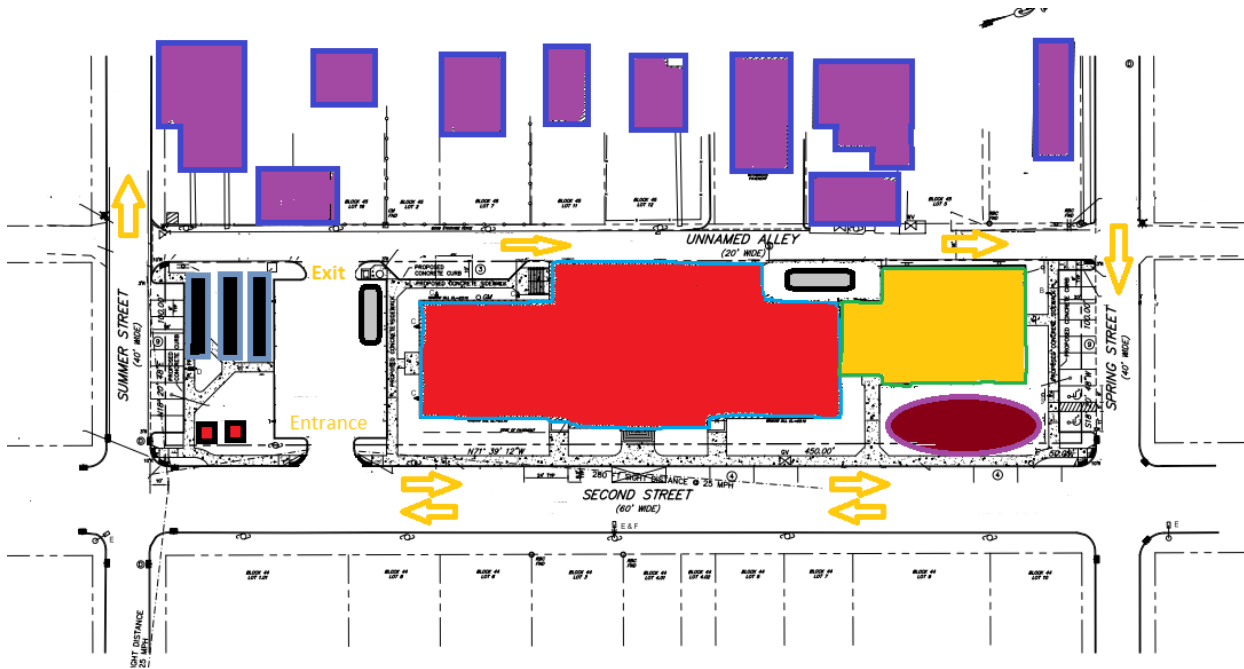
Construction Site Plan (Property of Jeremy Drummond)
